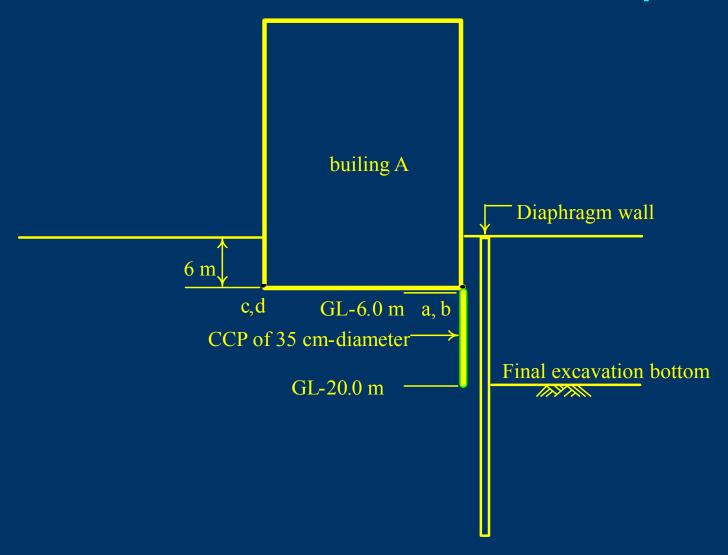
Arrangement of grouting at the building in the vicinity of the TNEC excavation (b) profile
